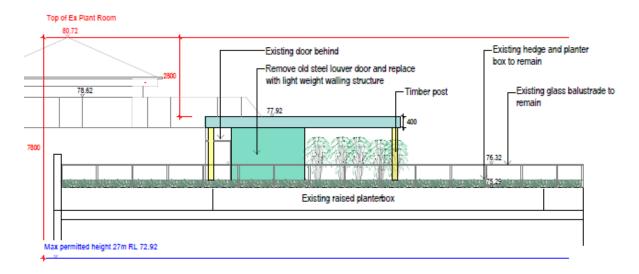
Eastern elevation (BB) of proposed pergola structure and new wall to the bathroom.
